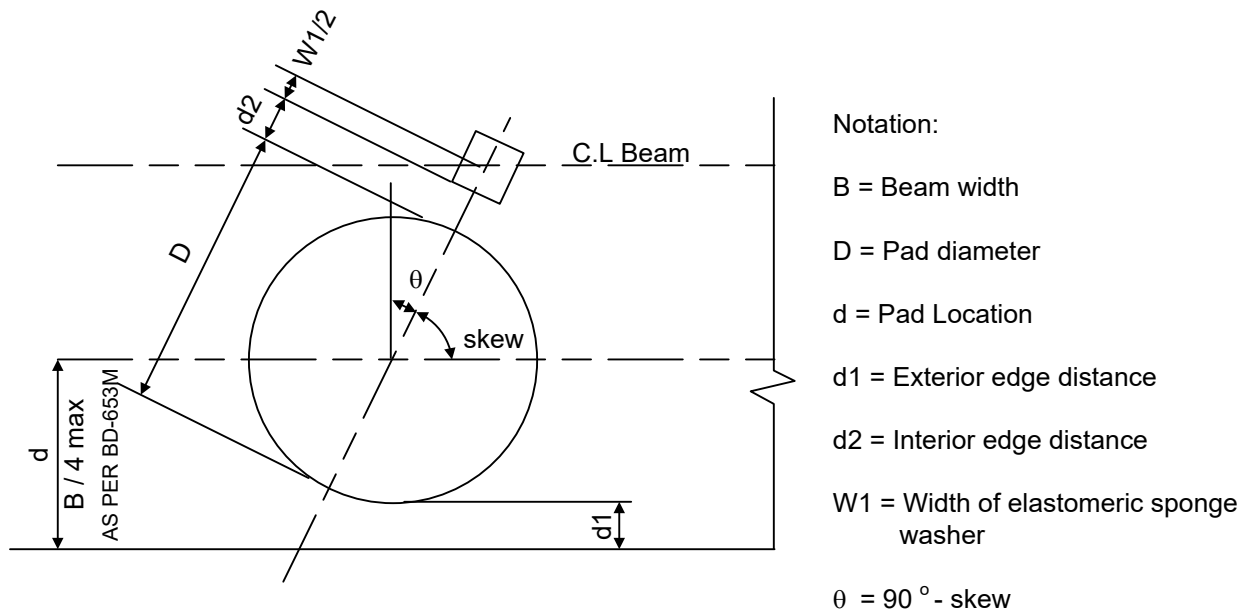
Two Circular Bearing Pads Per Beam End
